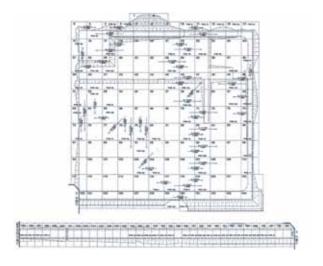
Site and Access Road earthwork balancing (Bulldozer)
